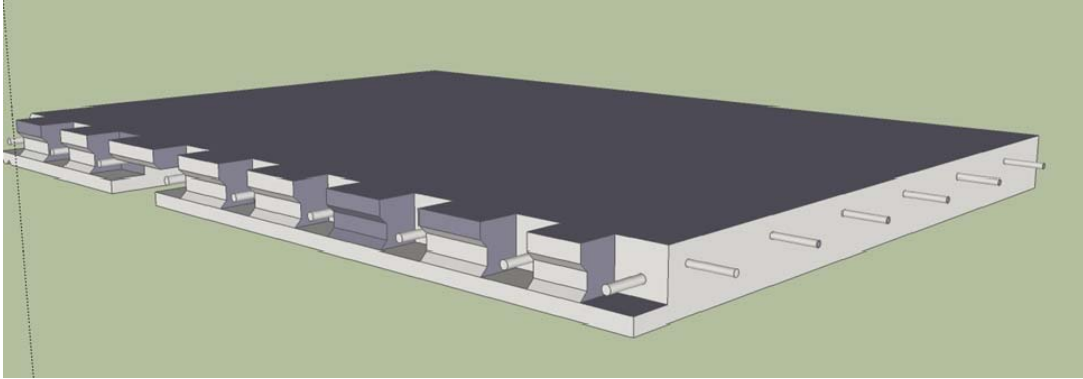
Typical Modified CD-2 System Full-Depth Panel Rendering
